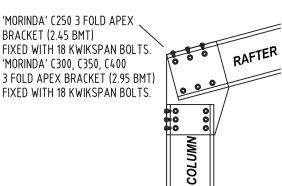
'MORINDA' KNEE 3 FOLD BRACKET CONNECTION
